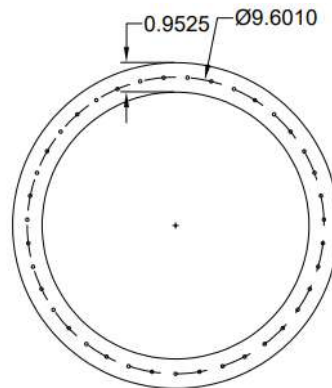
200 m cross section at 50 m, 39 ducts.
